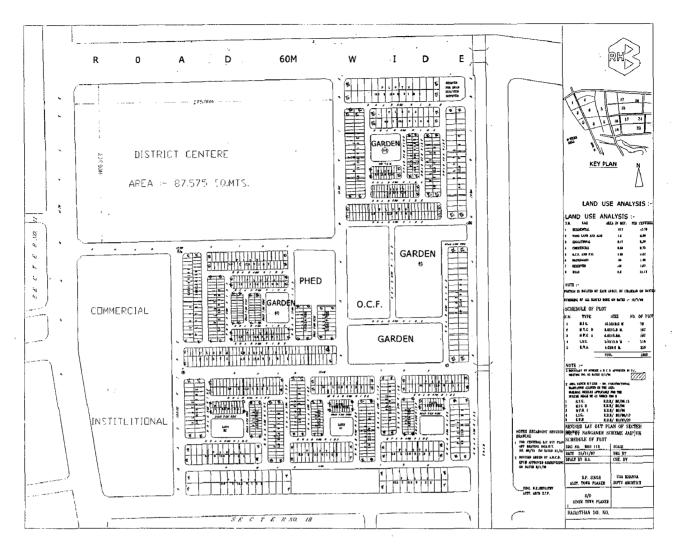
a 60 m. wide road betweem sector-16 & sector-9
